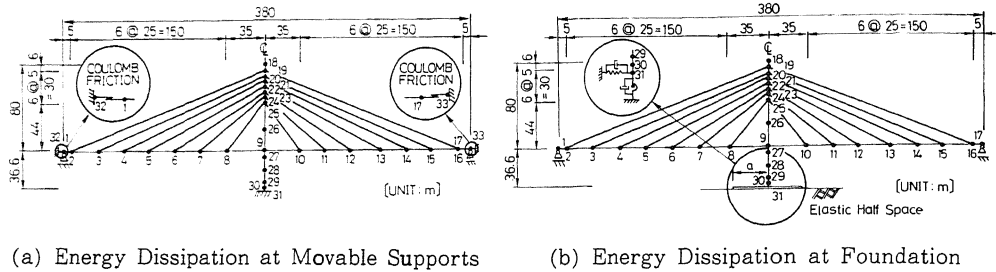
Cable-Stayed Bridge Studied and Analytical Idealization
